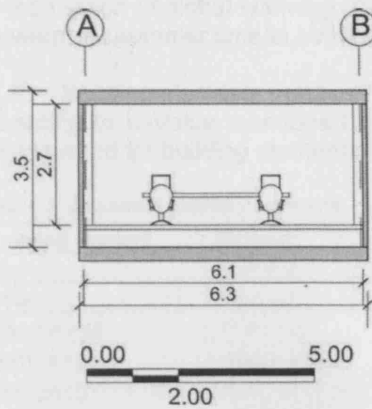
Section B-B of assumed office space (40% glazed area on south façade)
